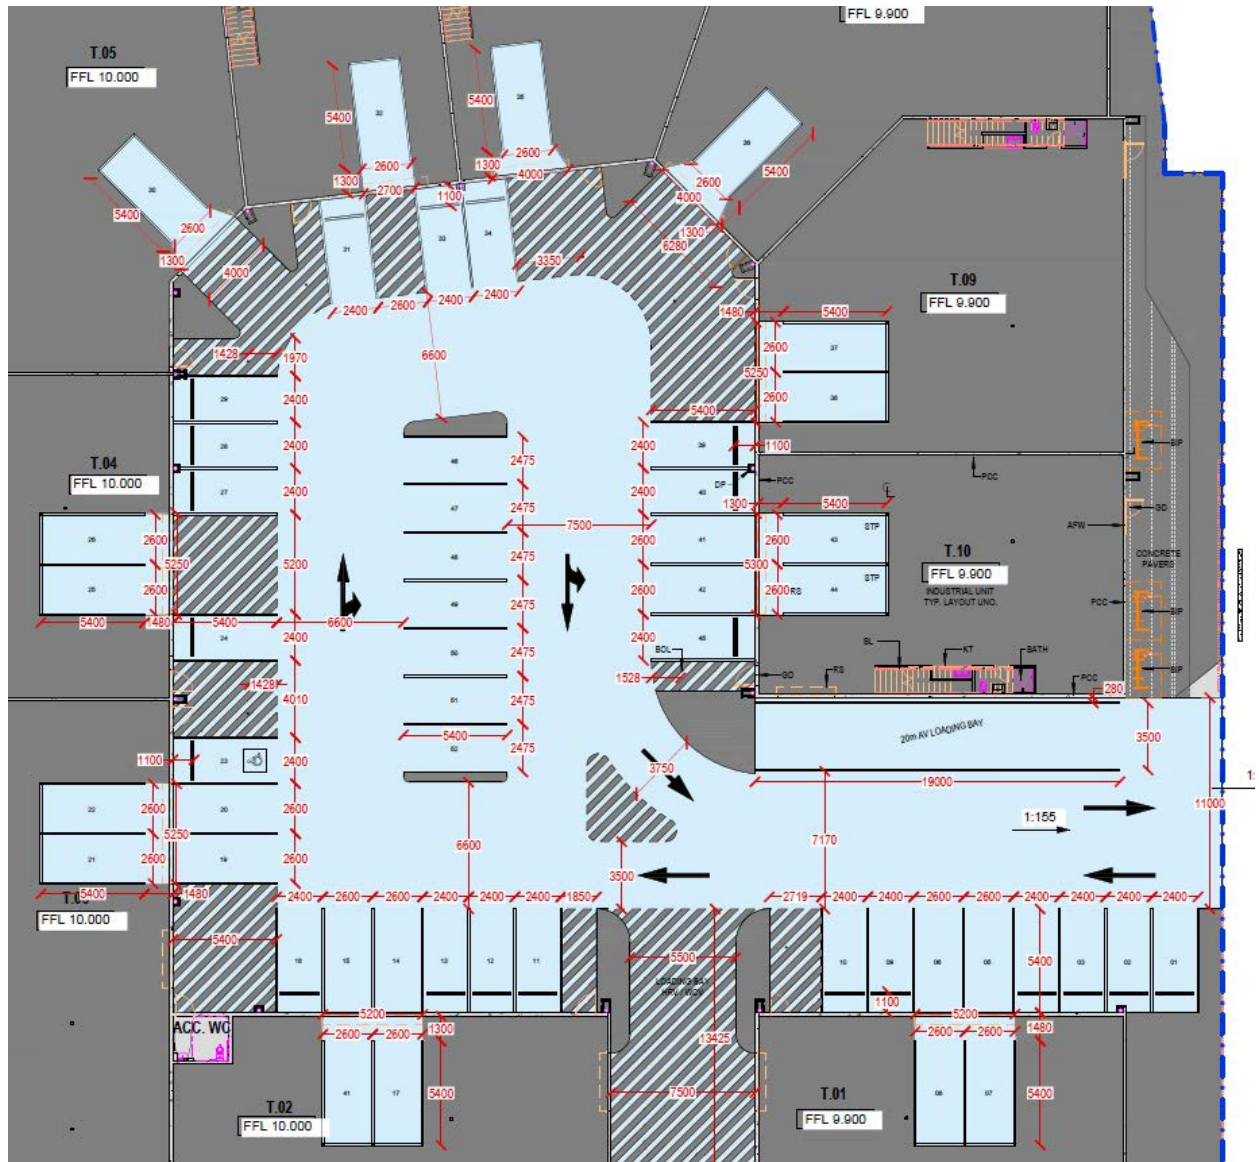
DIMENSIONED CAR PARKING LAYOUT
